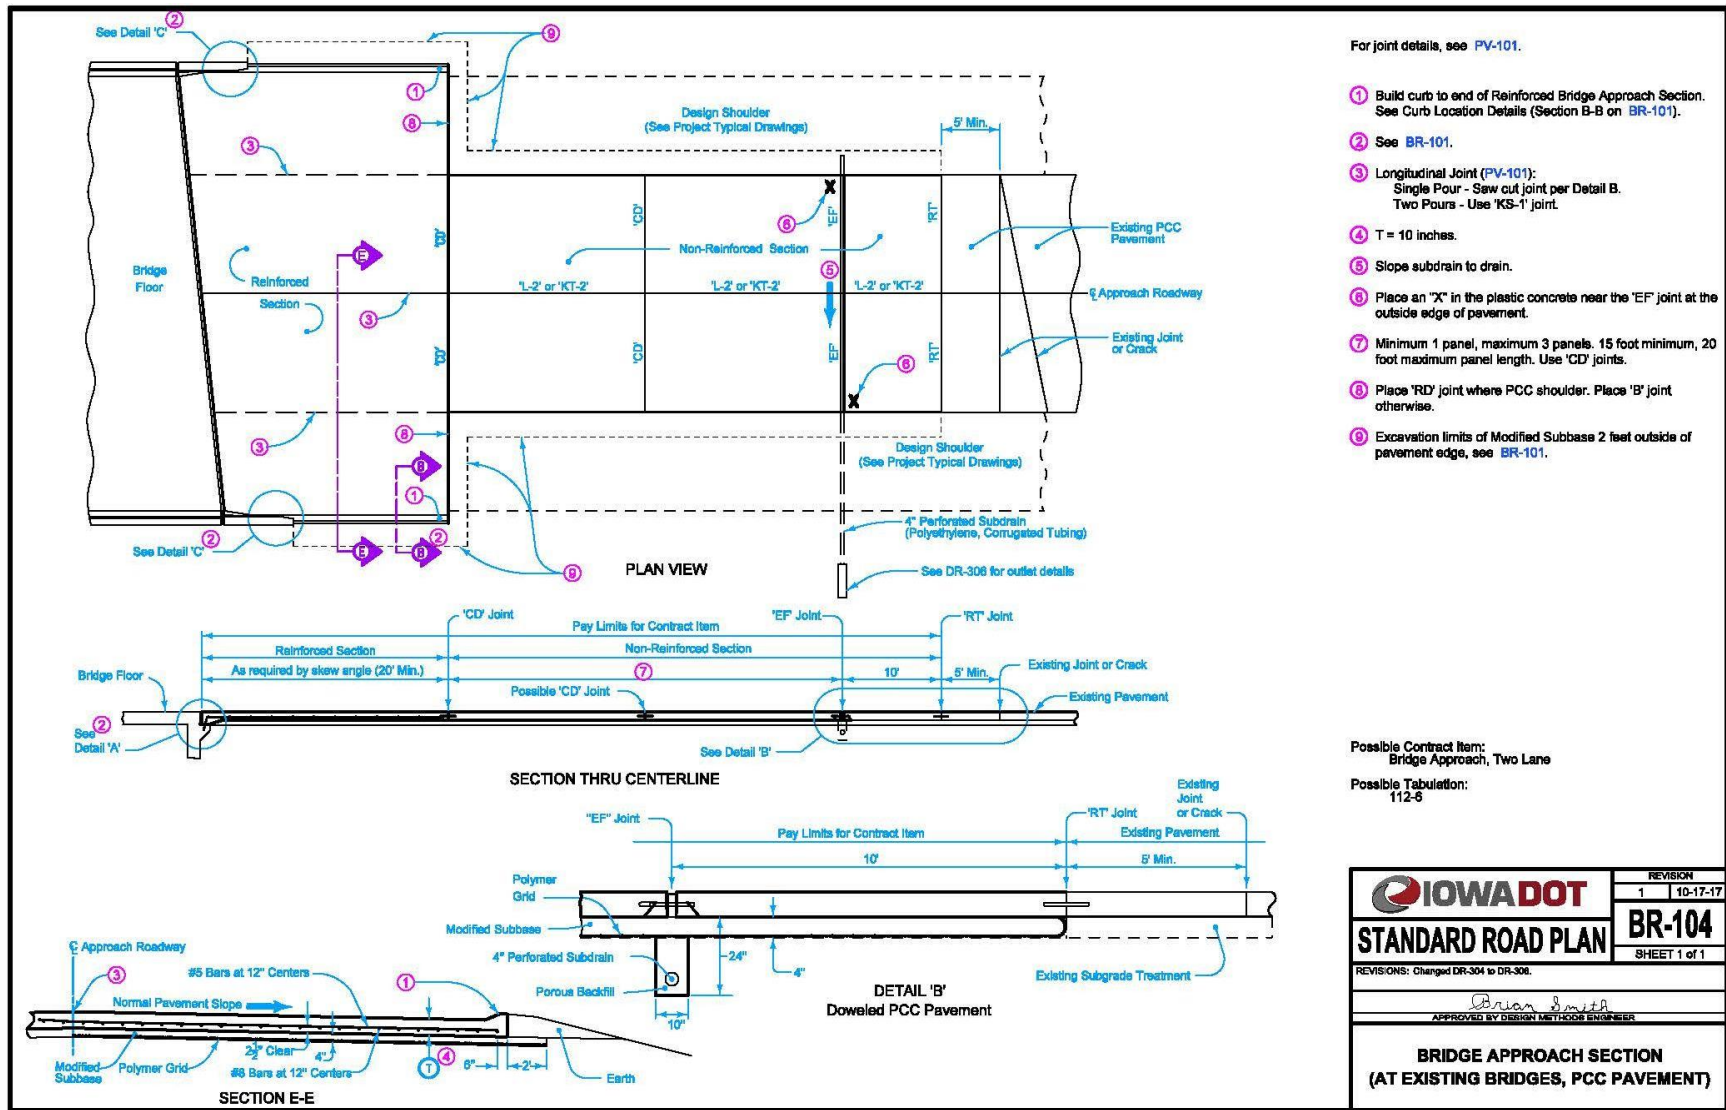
Iowa DOT Standard Road Plan BR-104 – Bridge Approach Section (at Existing Bridges, PCC Pavement) [68]
